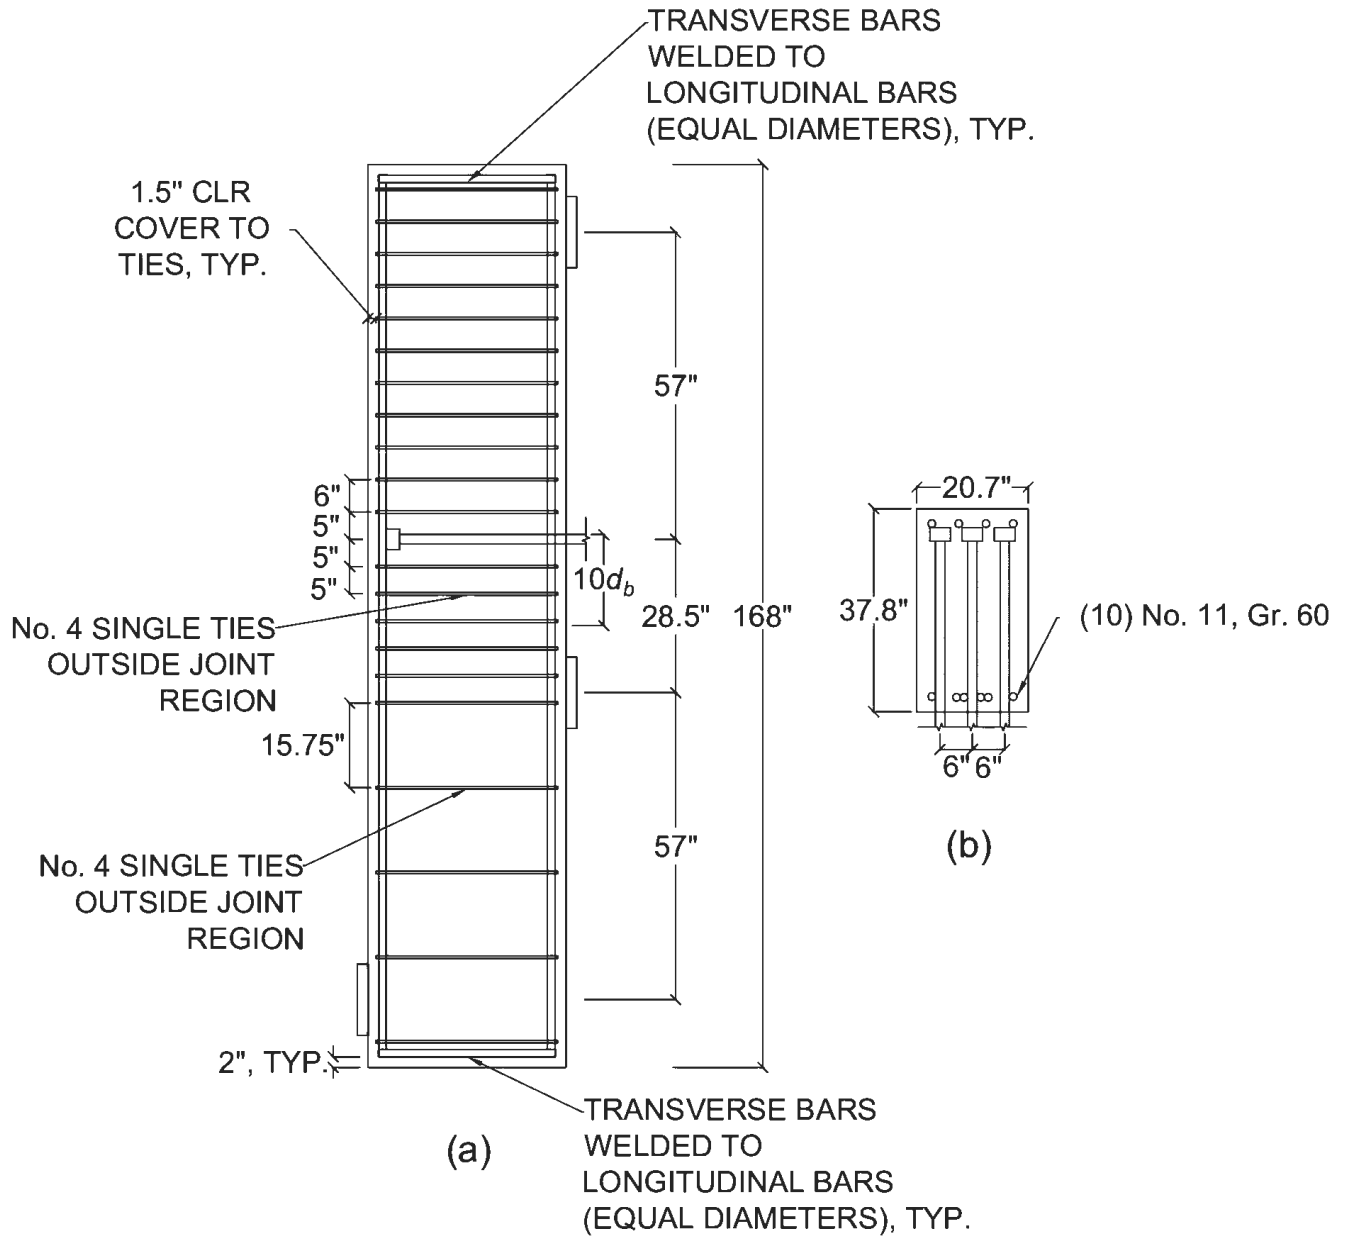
Details of reinforcement layout for No. 14 headed bar specimen 14-8: (a) elevation, (b) cross-section
